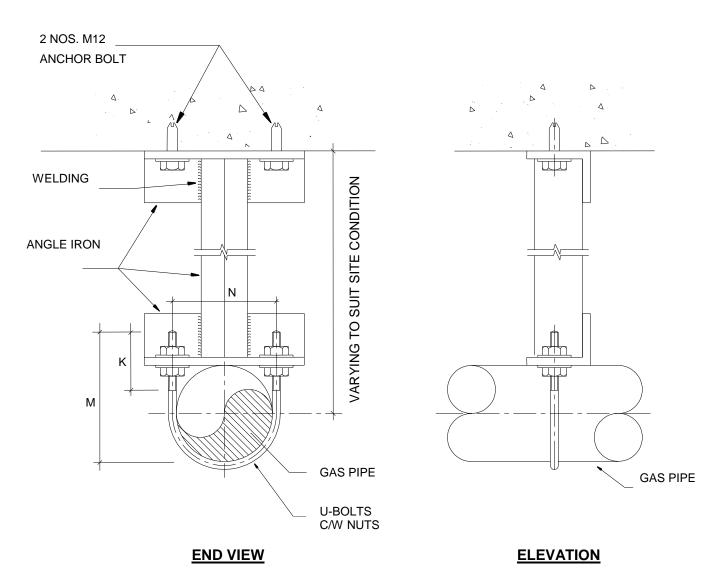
Typical Pipe Support for Gas Pipe (J)
